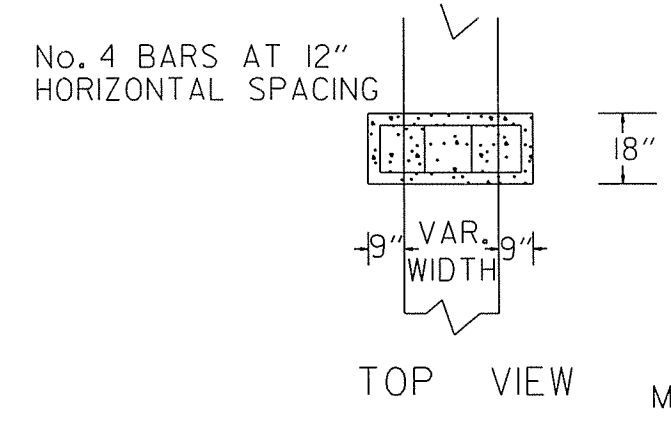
DETAIL SHOWING TRANSITION TO EXISTING PAVEMENT
